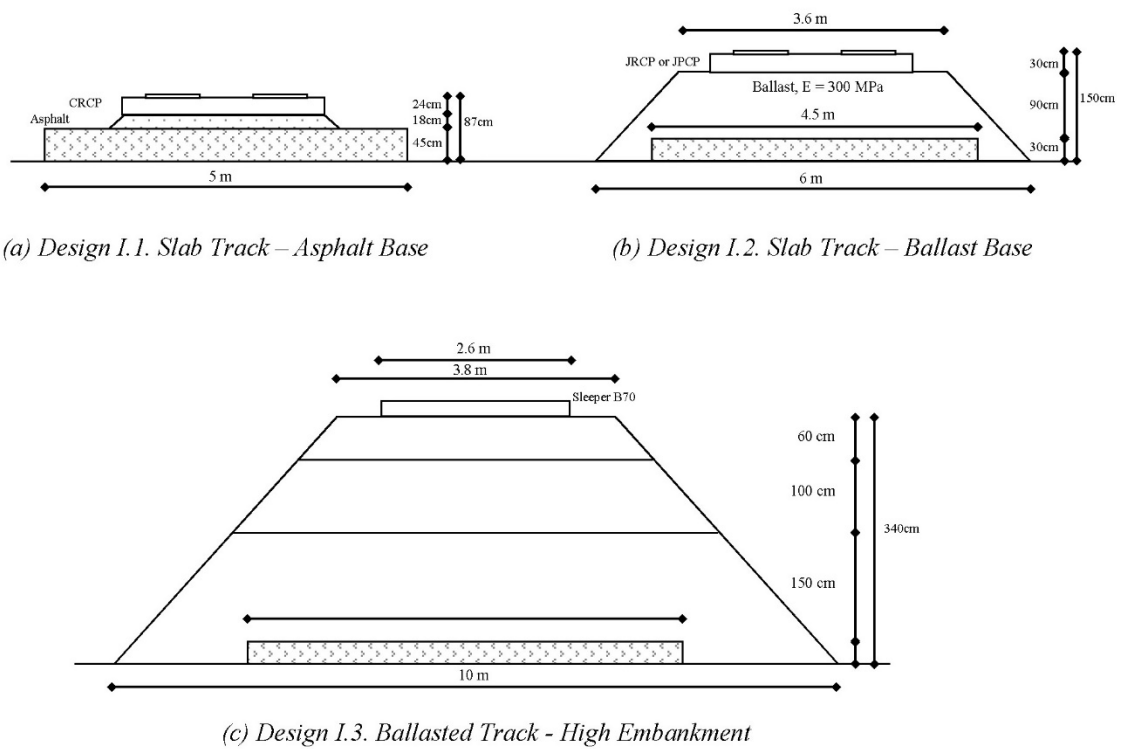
Cross section design of trackbed layer of slab track and ballasted track for Example Case I
